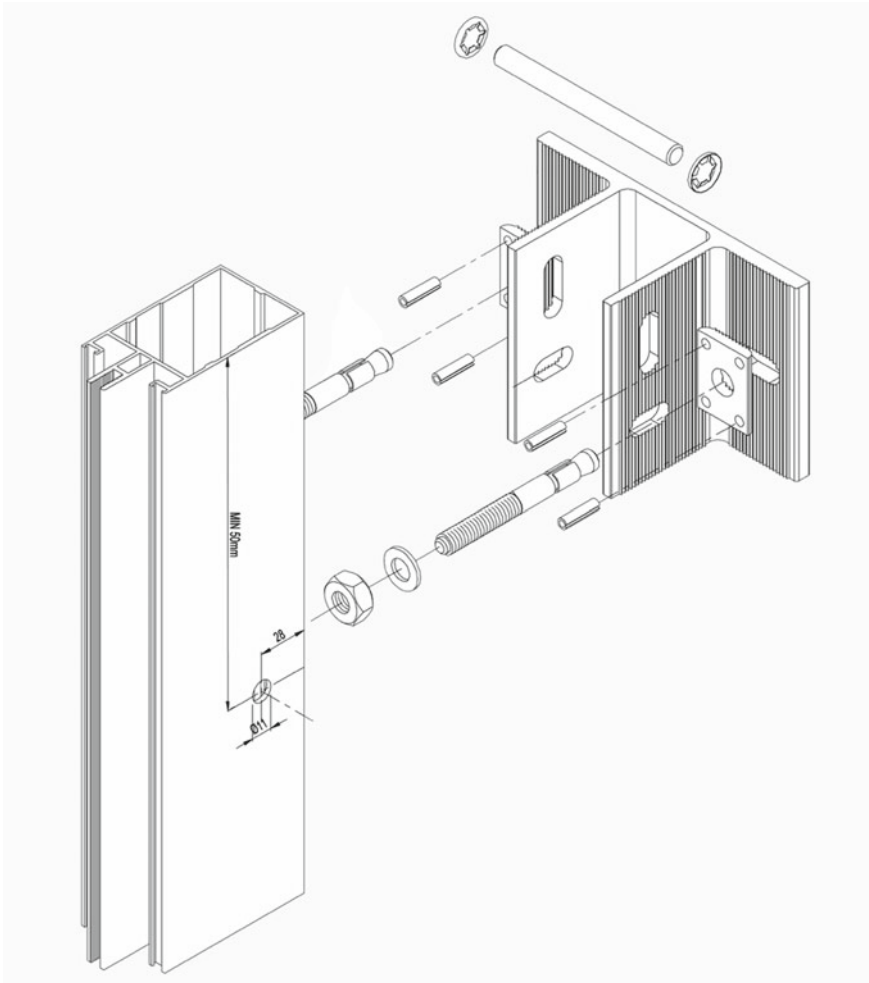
Brackets supporting the load of the façade system and the adjustment to construction tolerances, to ensure the alignment of the frame, assuming: • the adjustment of the frame in the three spatial directions during the assembly; • the adjustment of the mullions in the vertical direction (for movements due to expansion and contraction). © Courtesy of Reynaers
